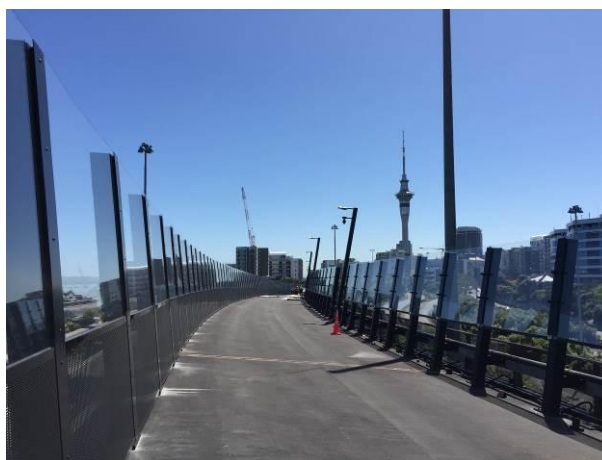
New design with guardrail to rear (perforated panels installed on left)
